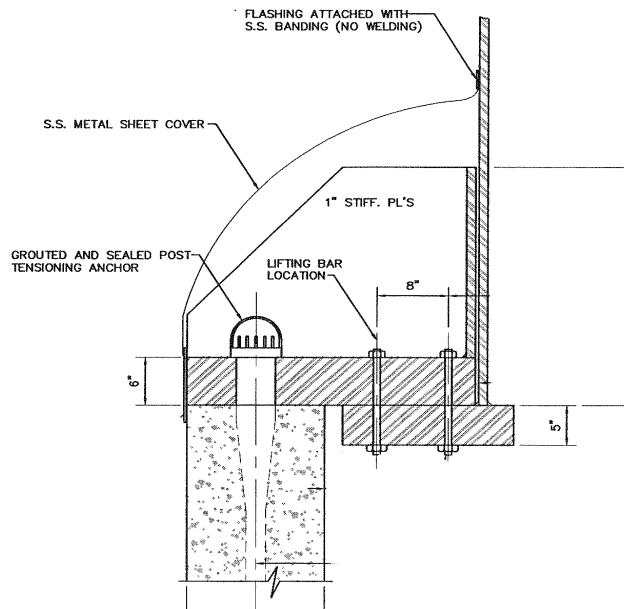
Concrete tower to steel tower connection for a steel/concrete hybrid tower
